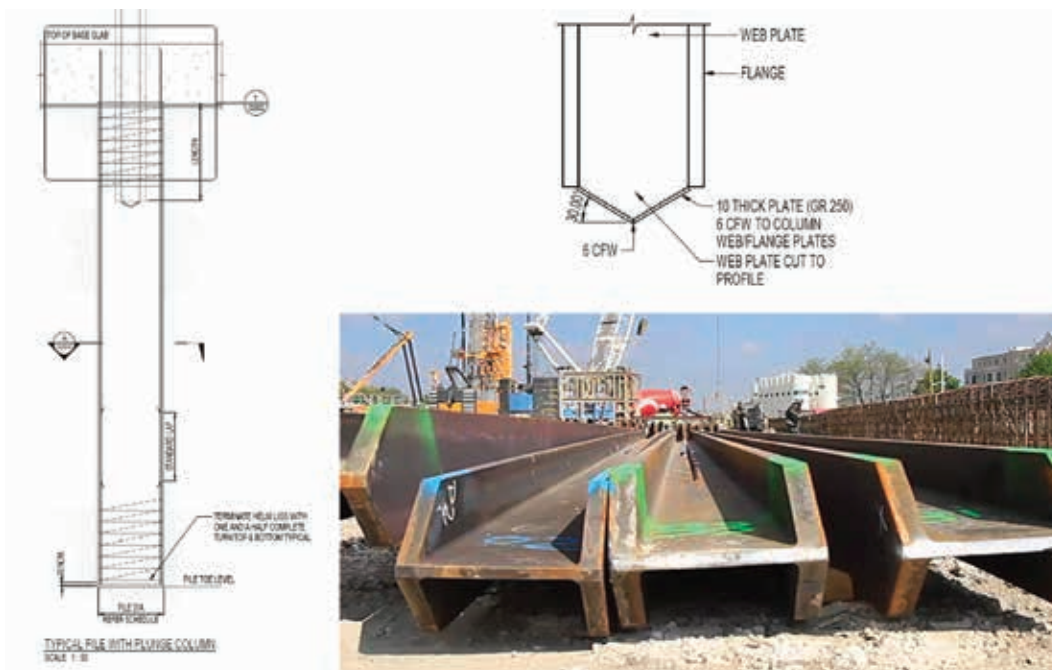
| Preparation of the plunge column end to penetrate into the fresh concrete at the bottom of the pile, Gare Pleyel in Paris (France)
